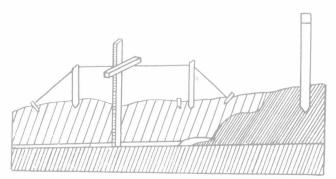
Diagram showing a simple plan of leveling the bottom of a drain.
